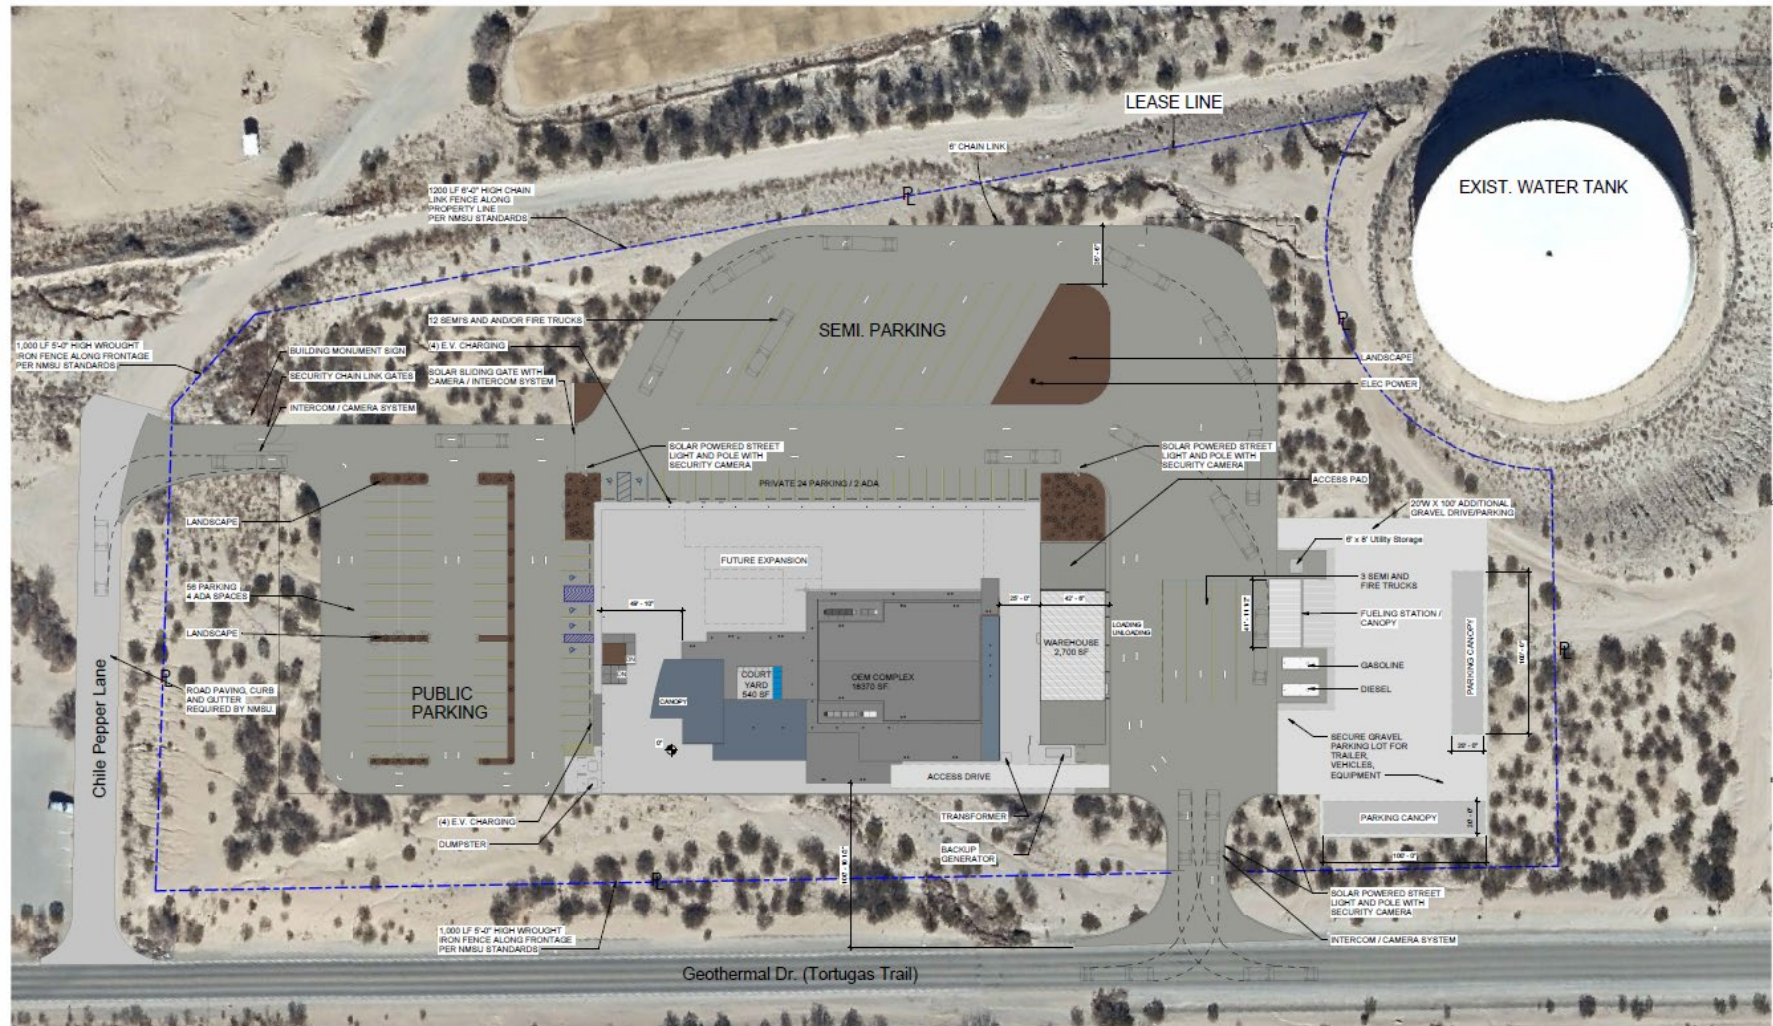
Site plan showing proposed work. Image via Applicant, 2024.
